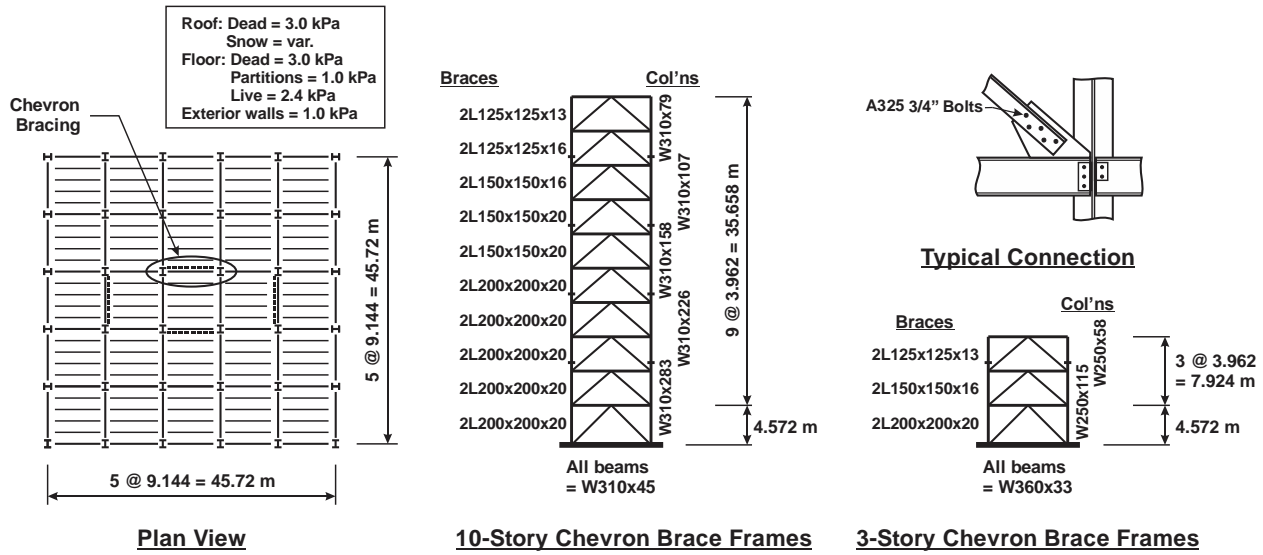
Plan view, braced frame elevations and typical connection of the 3- and 10-story buildings.
